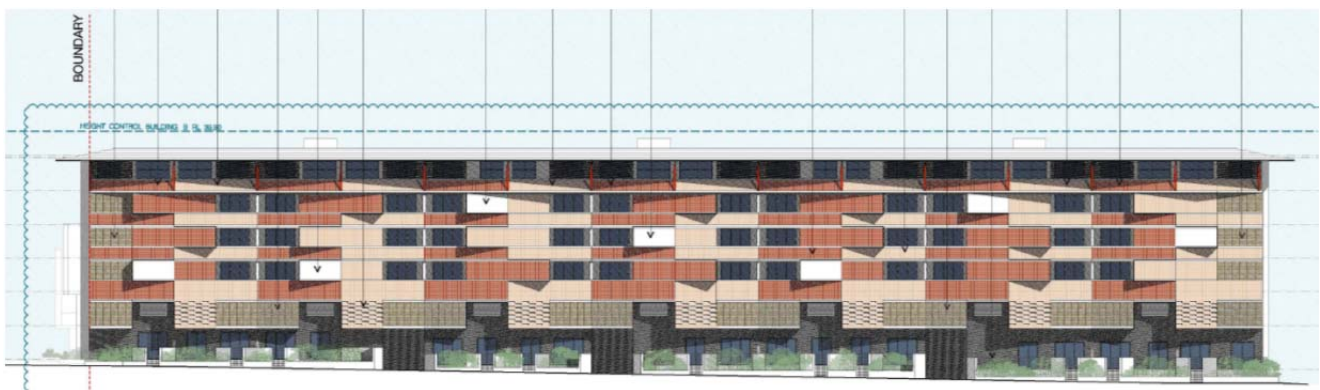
Revised Building B north elevation (view from Future Sonny Leonard Street)
